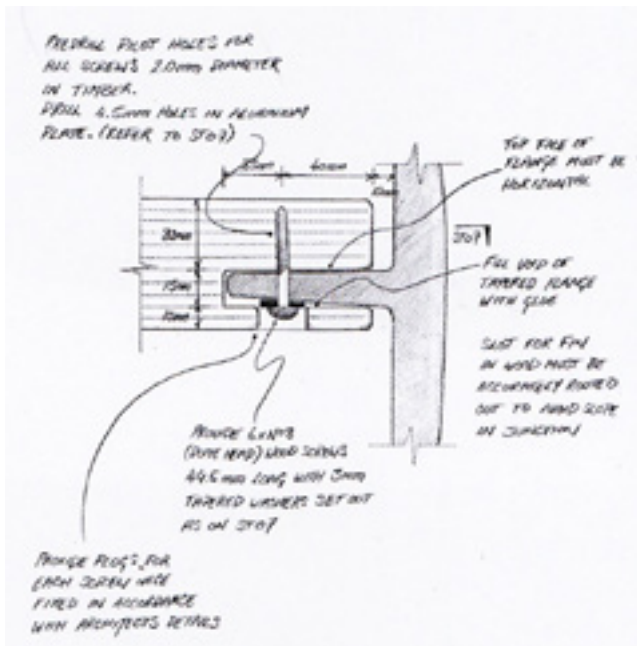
Connection detail showing fixing of timber tread to a stringer with hidden screws
